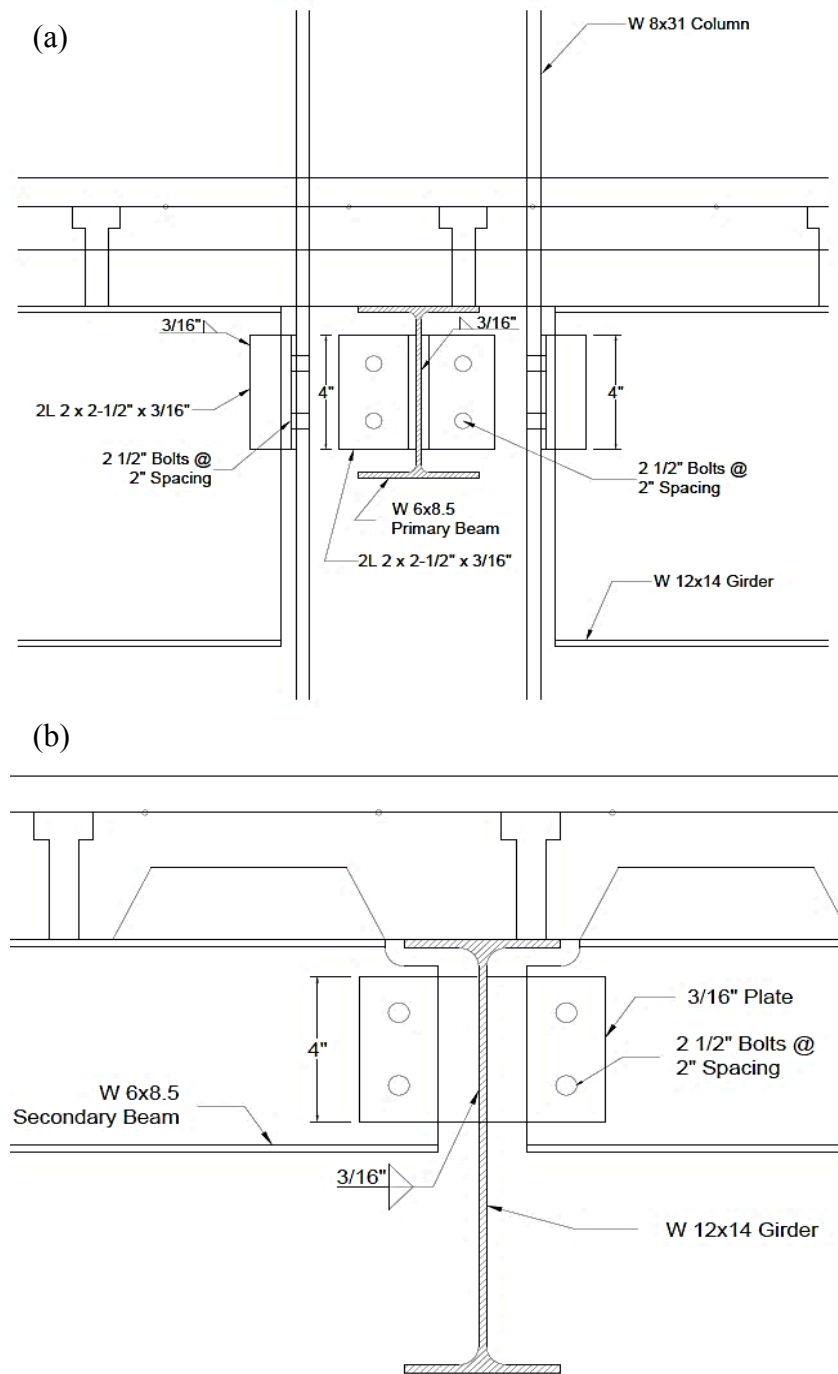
Connection details: (a) beam-to-column double angle connection; (b) secondary beam-to-girder shear tab connection. (From Hull (2013))
